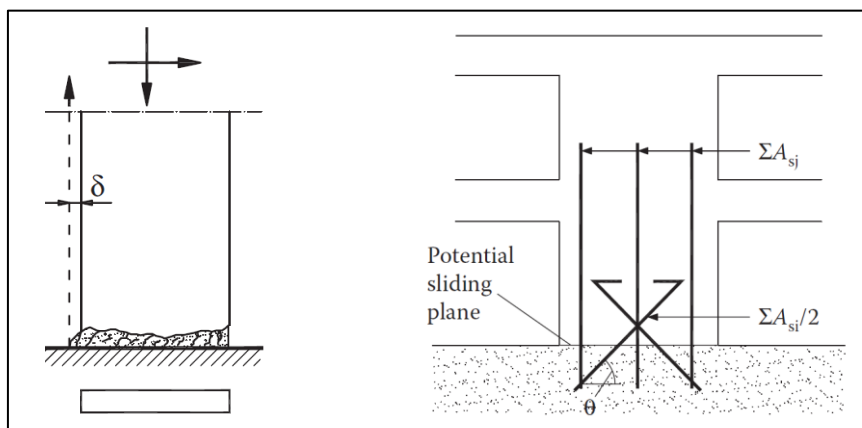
Sliding shear failure and bidiagonal X shaped reinforcement for added resistance [5]
